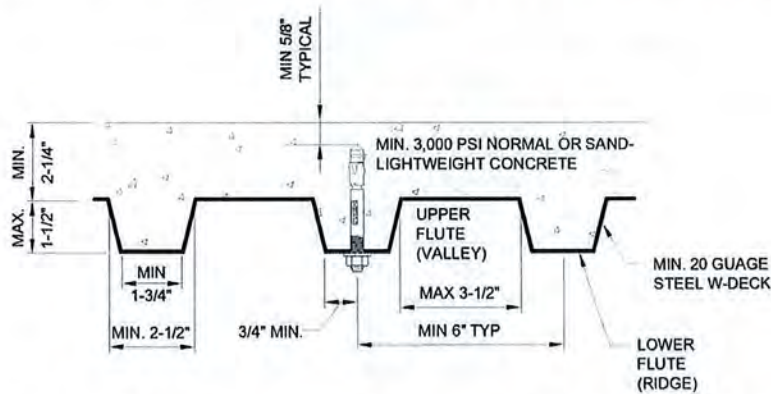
B—INSTALLATION IN THE SOFFIT OF CONCRETE OVER METAL DECK FLOOR AND ROOF ASSEMBLIES – B DECK^{1,2}
